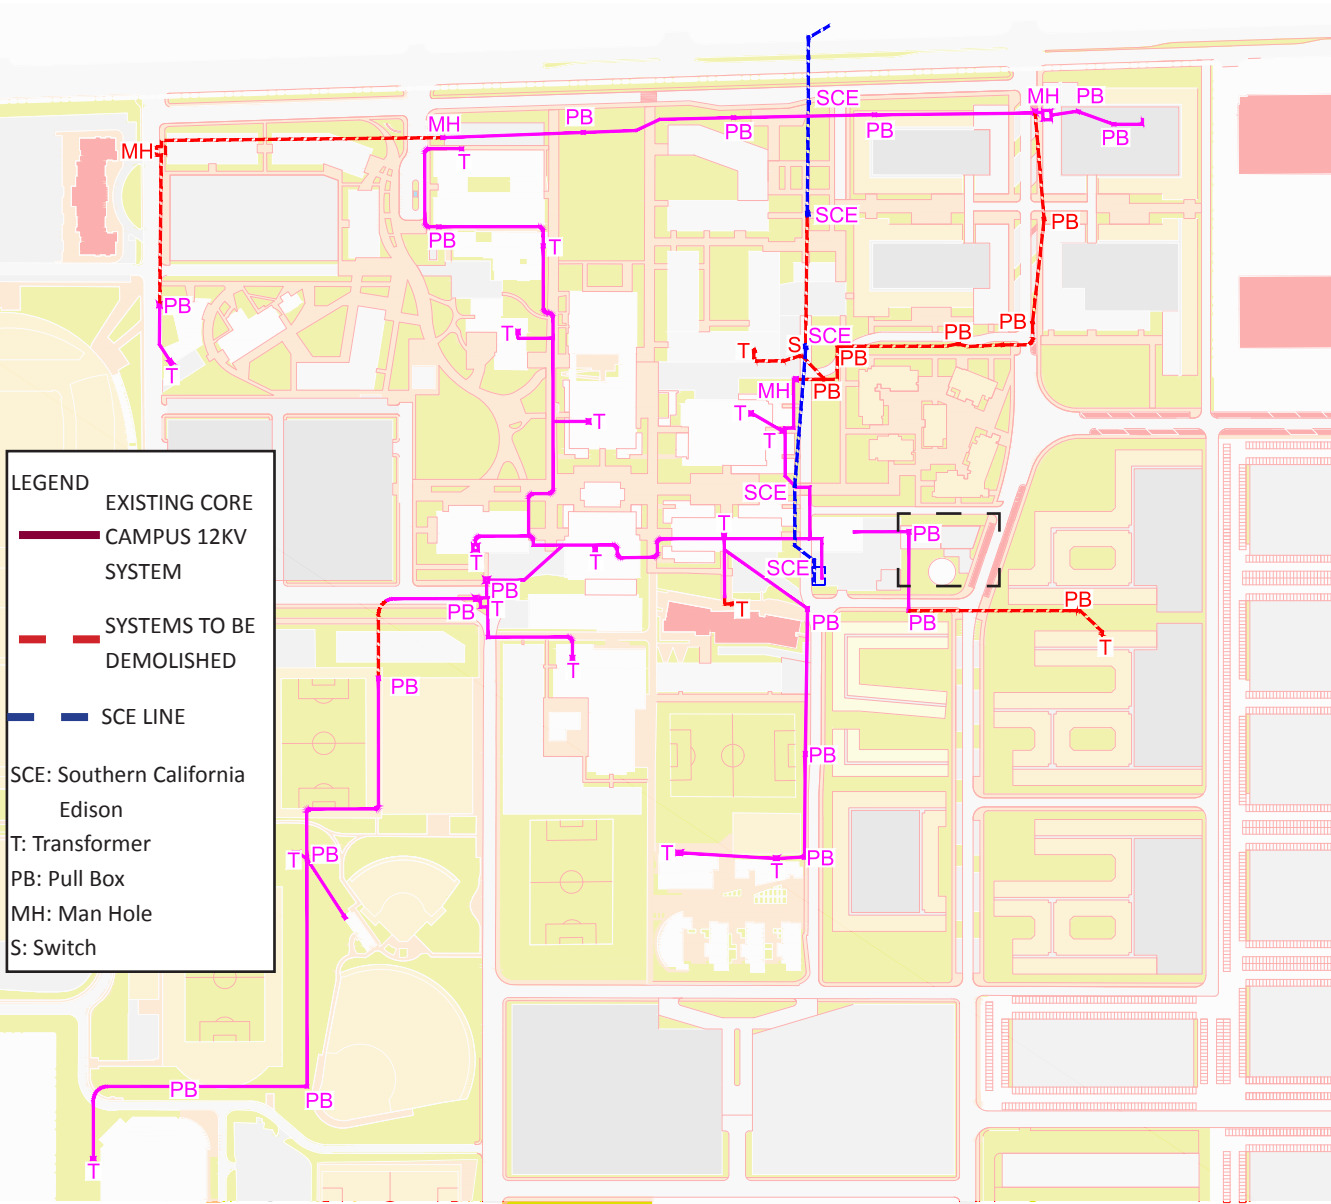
EXISTING 12KV POWER DISTRIBUTION LAYOUT, DEMO PLAN
